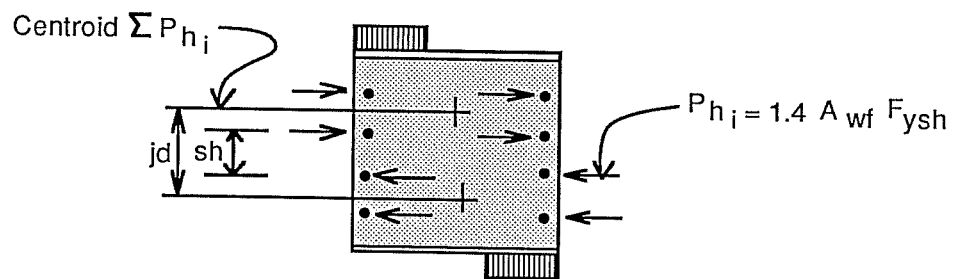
Shear Friction Mechanism (Specimens 3 & 12)
